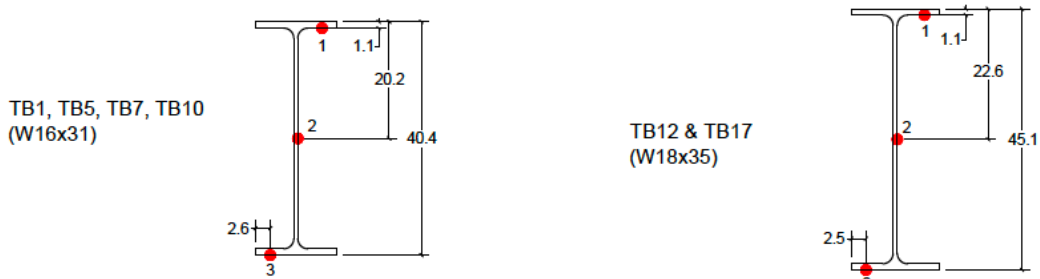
Locations of thermocouples mounted on steel beams and girders of the test floor assembly. Dimensions and coordinates are in cm.
